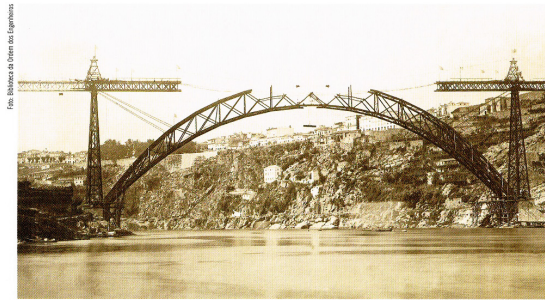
Construction stage of Maria Pia bridge in 15/8/1877 [10] Vasconcelos
